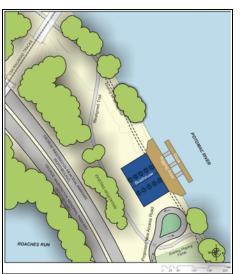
Conceptual Site Plan – Maximum Program, 14th Street Bridge Site
